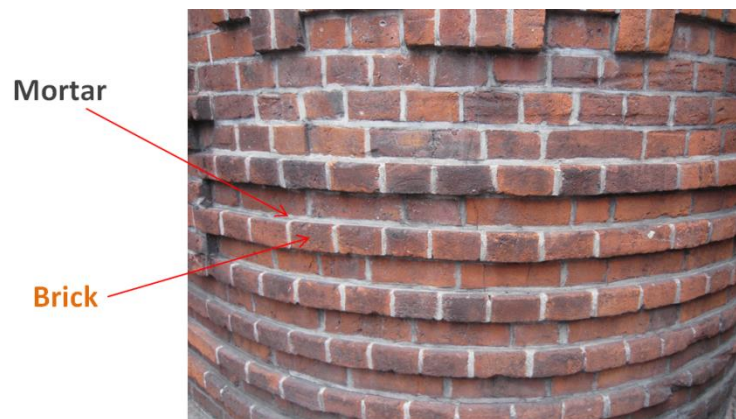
Masonry wall with its components, ceramic bricks and cement mortar
